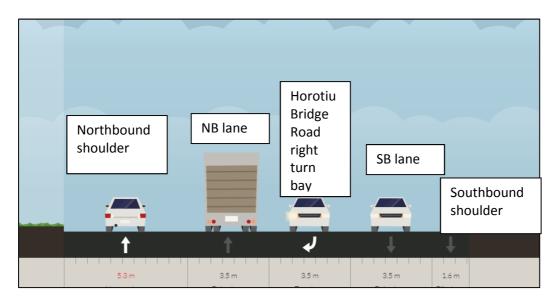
Existing River Road cross section just north of Horotiu Bridge Road.
